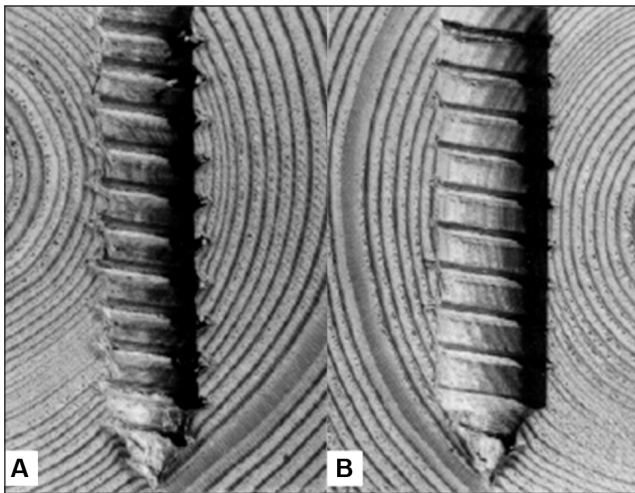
A, Clean-cut, deep penetration of thread made by lag screw turned into a lead hole of proper size, and B, rough, shallow penetration of thread made by lag screw turned into oversized lead hole.
